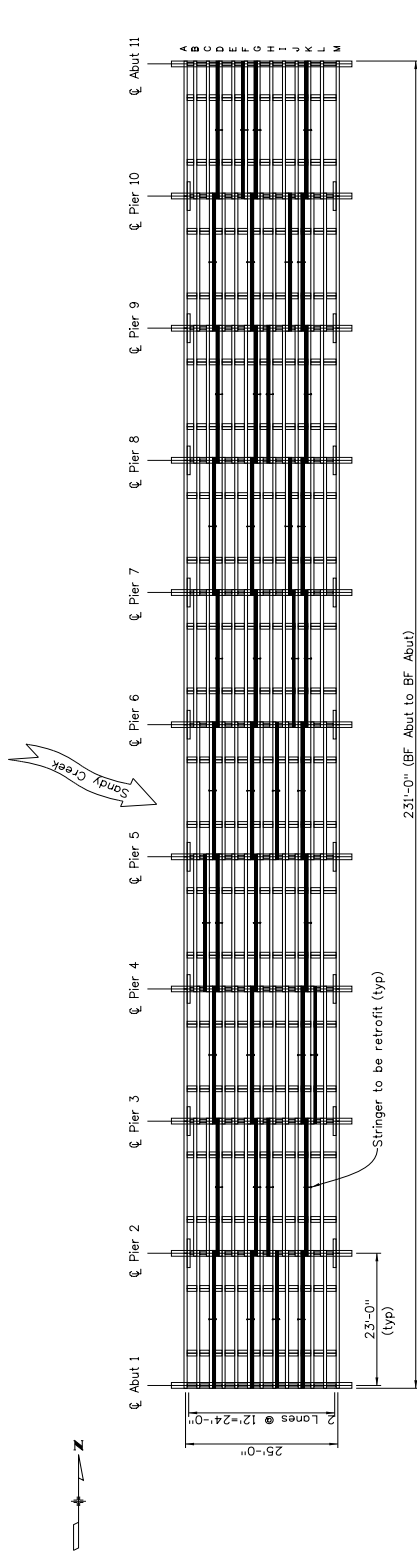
(H)-1 Current worksheet for Timber Girder repaired with Steel Sister Beam
